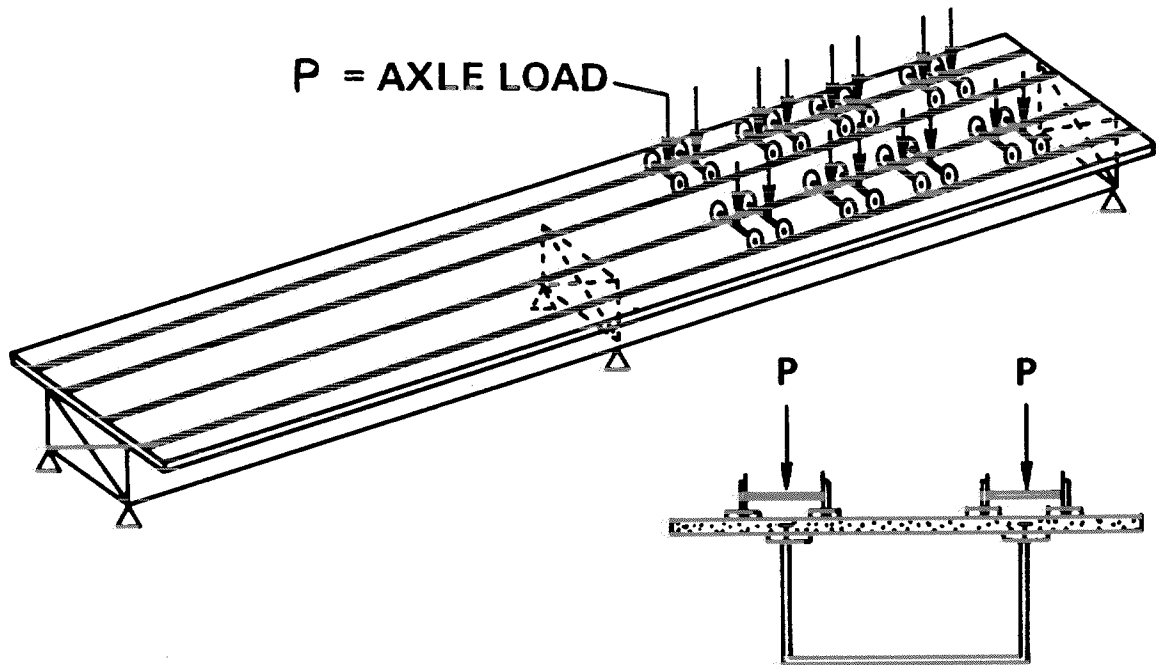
Double Track Mass-Transit Railway Box-Girder Bridge
